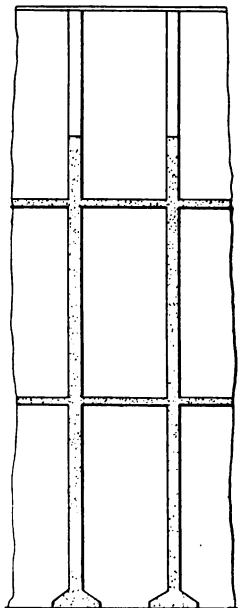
Section of Dam 50 feet high with two Platforms built on Rock.
